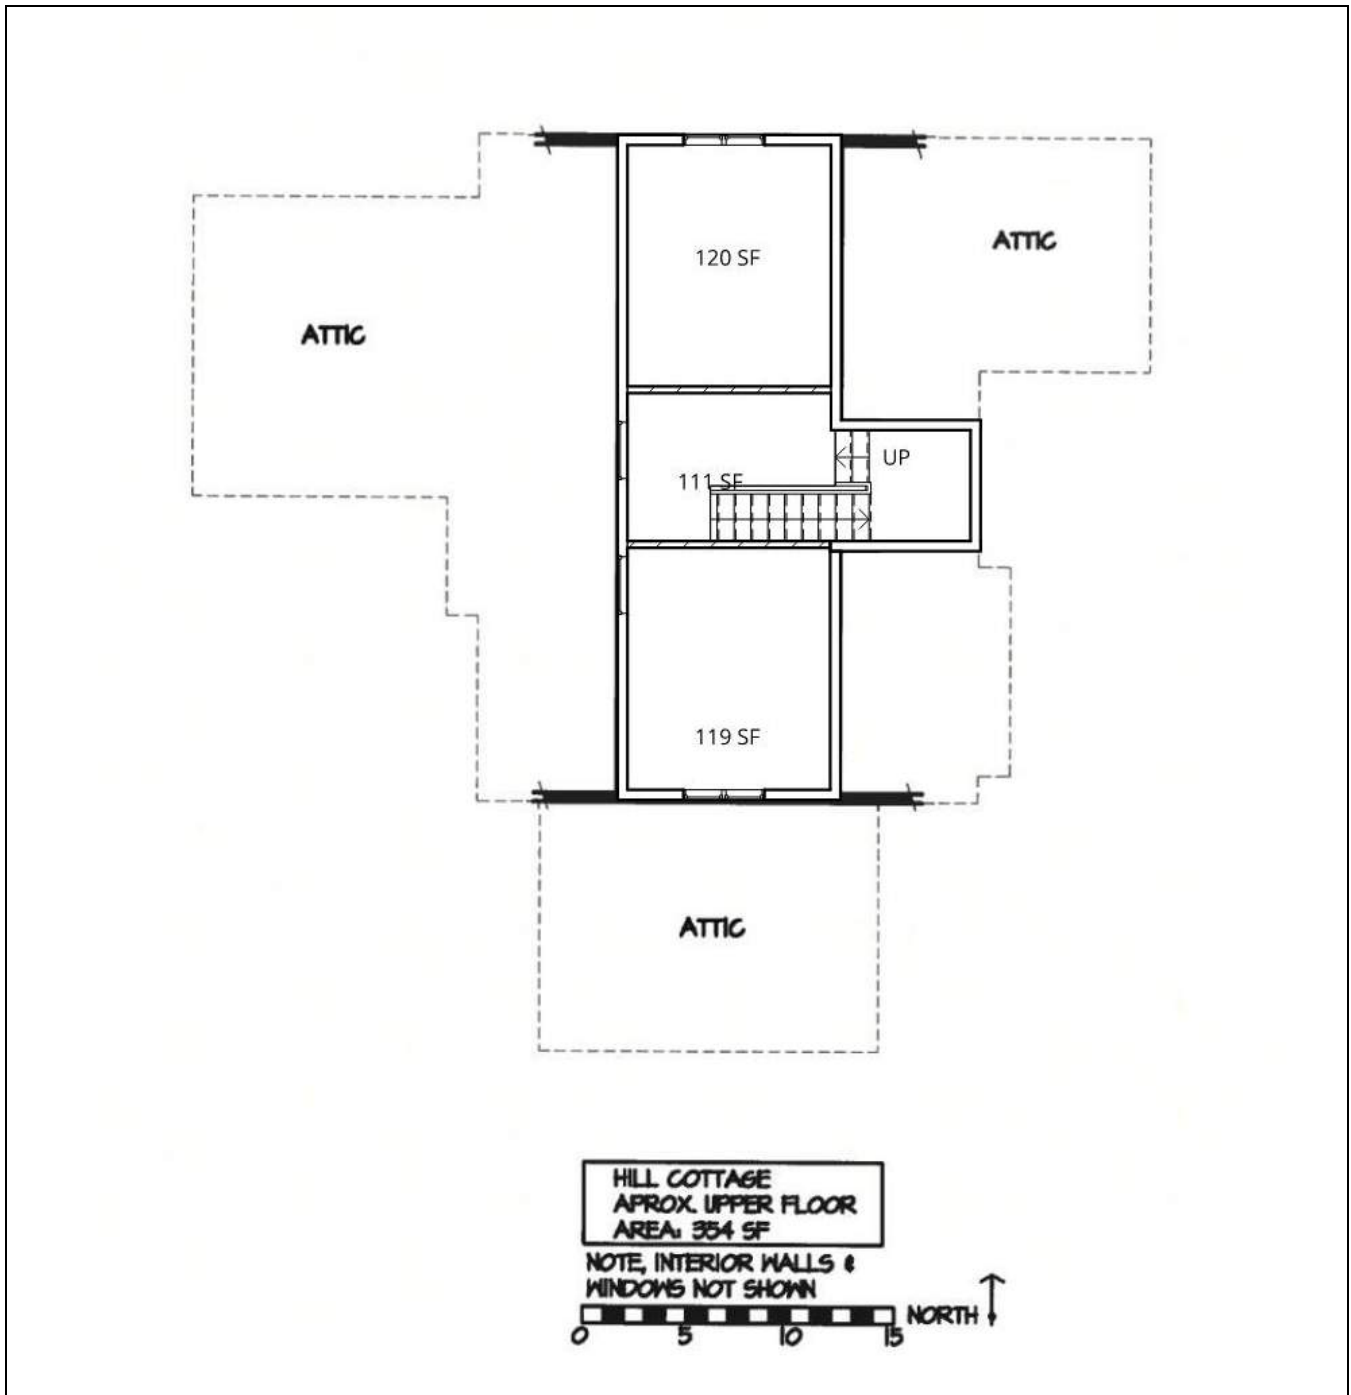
Attic level, Hill Cottage. Accessed from a set of stairs from the main floor. Interior layout overlaid on record drawing.
